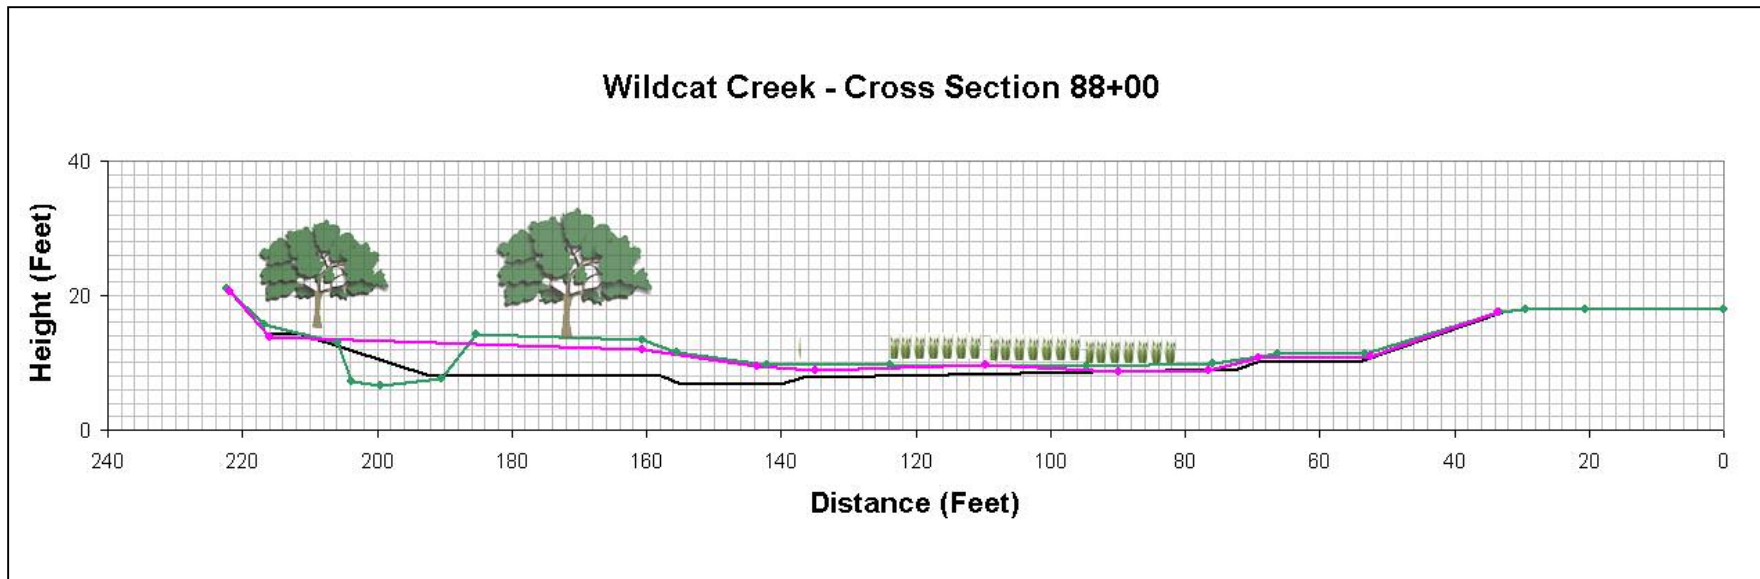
WILDCAT CREEK CROSS SECTION 88+00, LOOKING DOWNSTREAM
